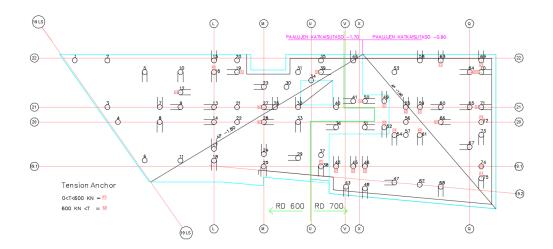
AutoCAD drawing showing the Layout and pile plan.
